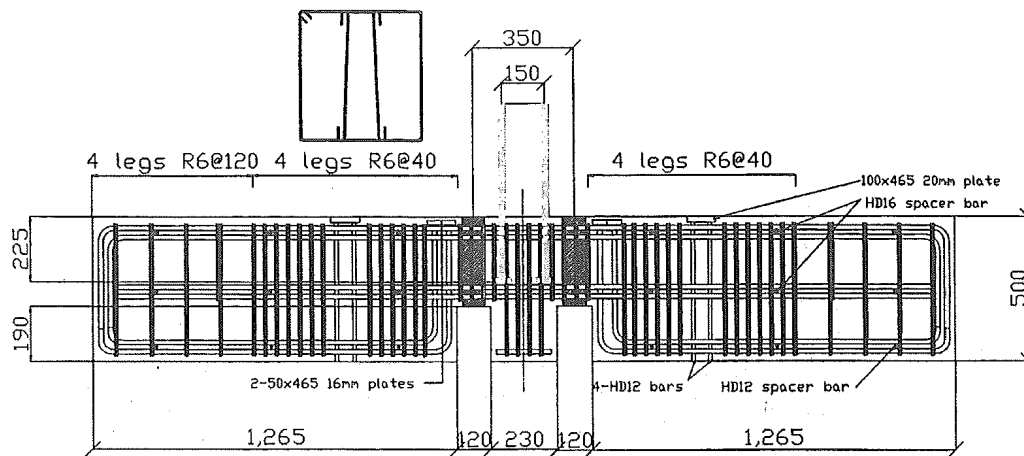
Reinforcement layout of Unit 2 foundation beam.
